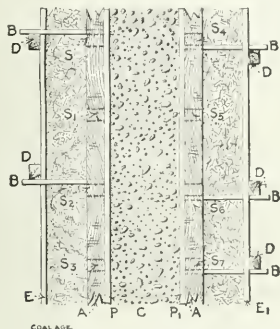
PLAN VIEW OF WALL WITH CONCRETE AND MANURE IN PLACE
